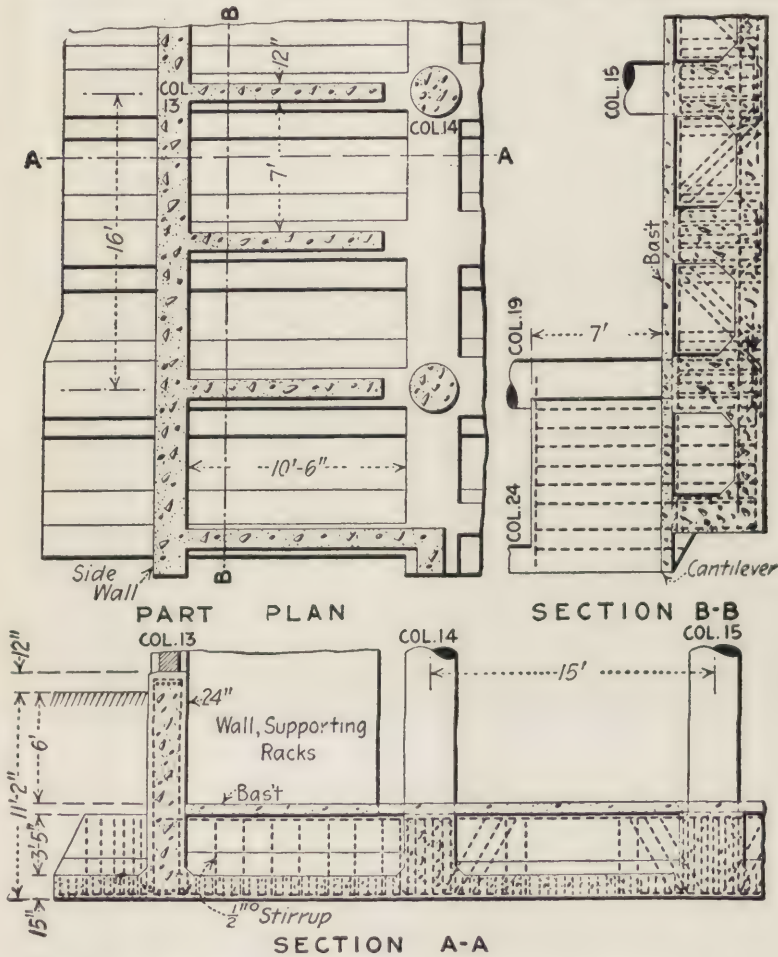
Monolithic Foundation under the Felt & Tarrant Building.
